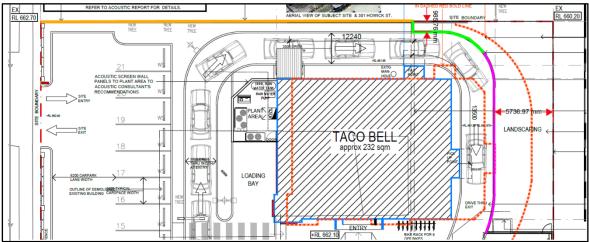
Location of Existing (Orange) and Proposed Retaining Walls (Green and Pink) - Lot 5 DP 1086710 (105 Stewart Street) and Lot 1 DP 737574 (103 Stewart Street)
